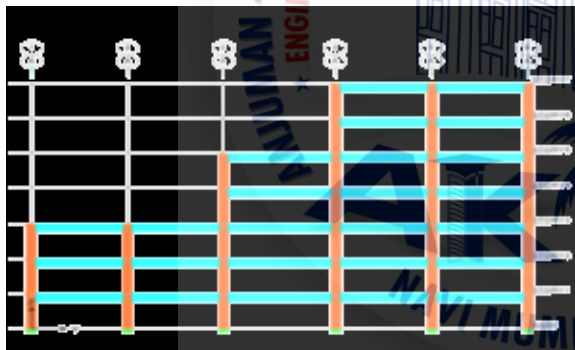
Elevation of In-Plane Discontinuity Building [12]
